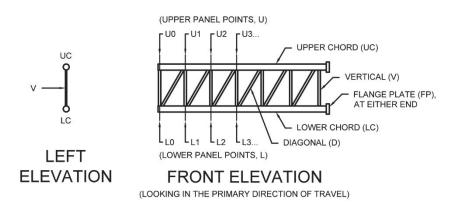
Methodology for Panel Point Numbering and Component Labeling of Two Chord Truss Sign Structures without Splices
